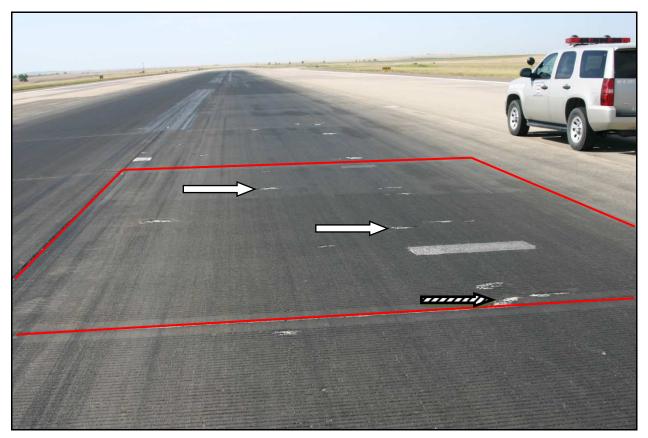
Example 2: interior of slab on runway touchdown zone blackened with tire rubber.
